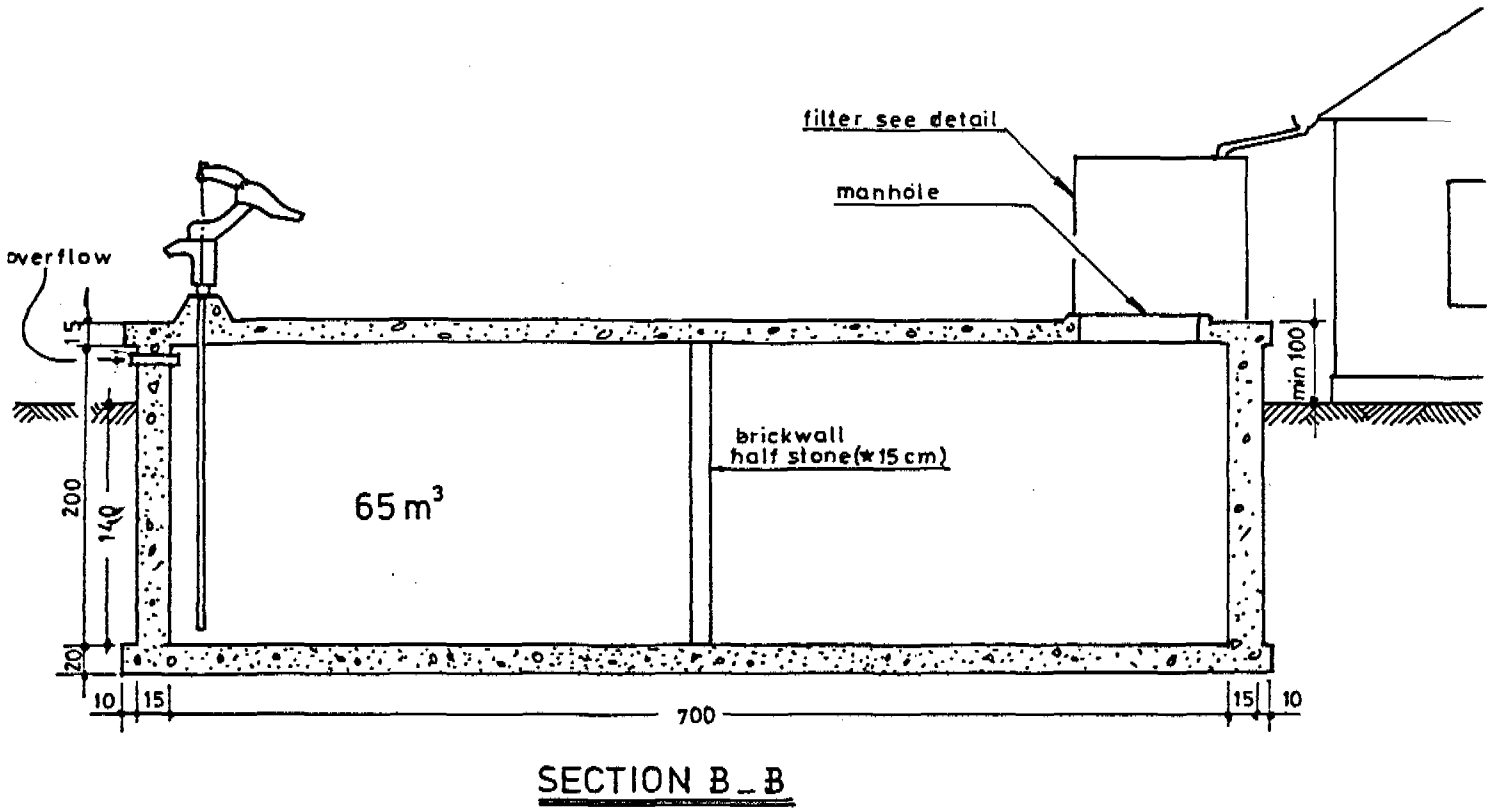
Reinforced concrete storage tank (65,000 litres)
